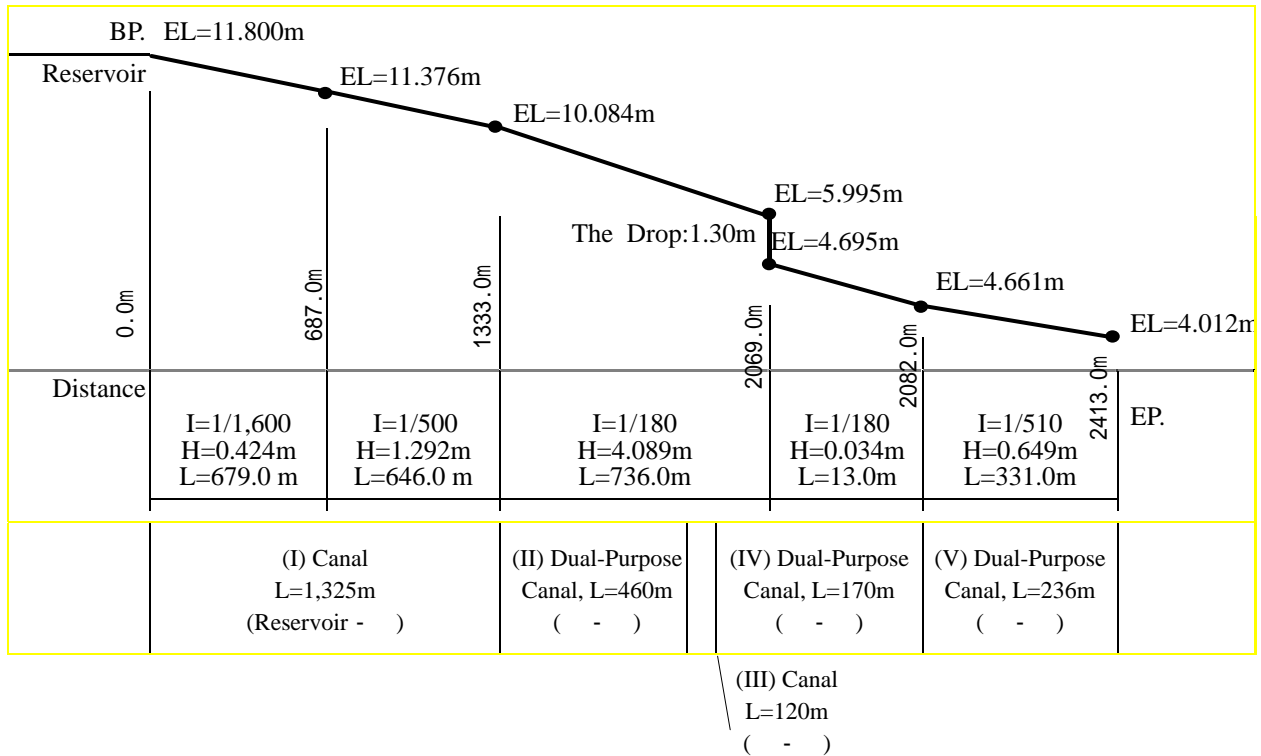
Ho Thanh Canal Profile
